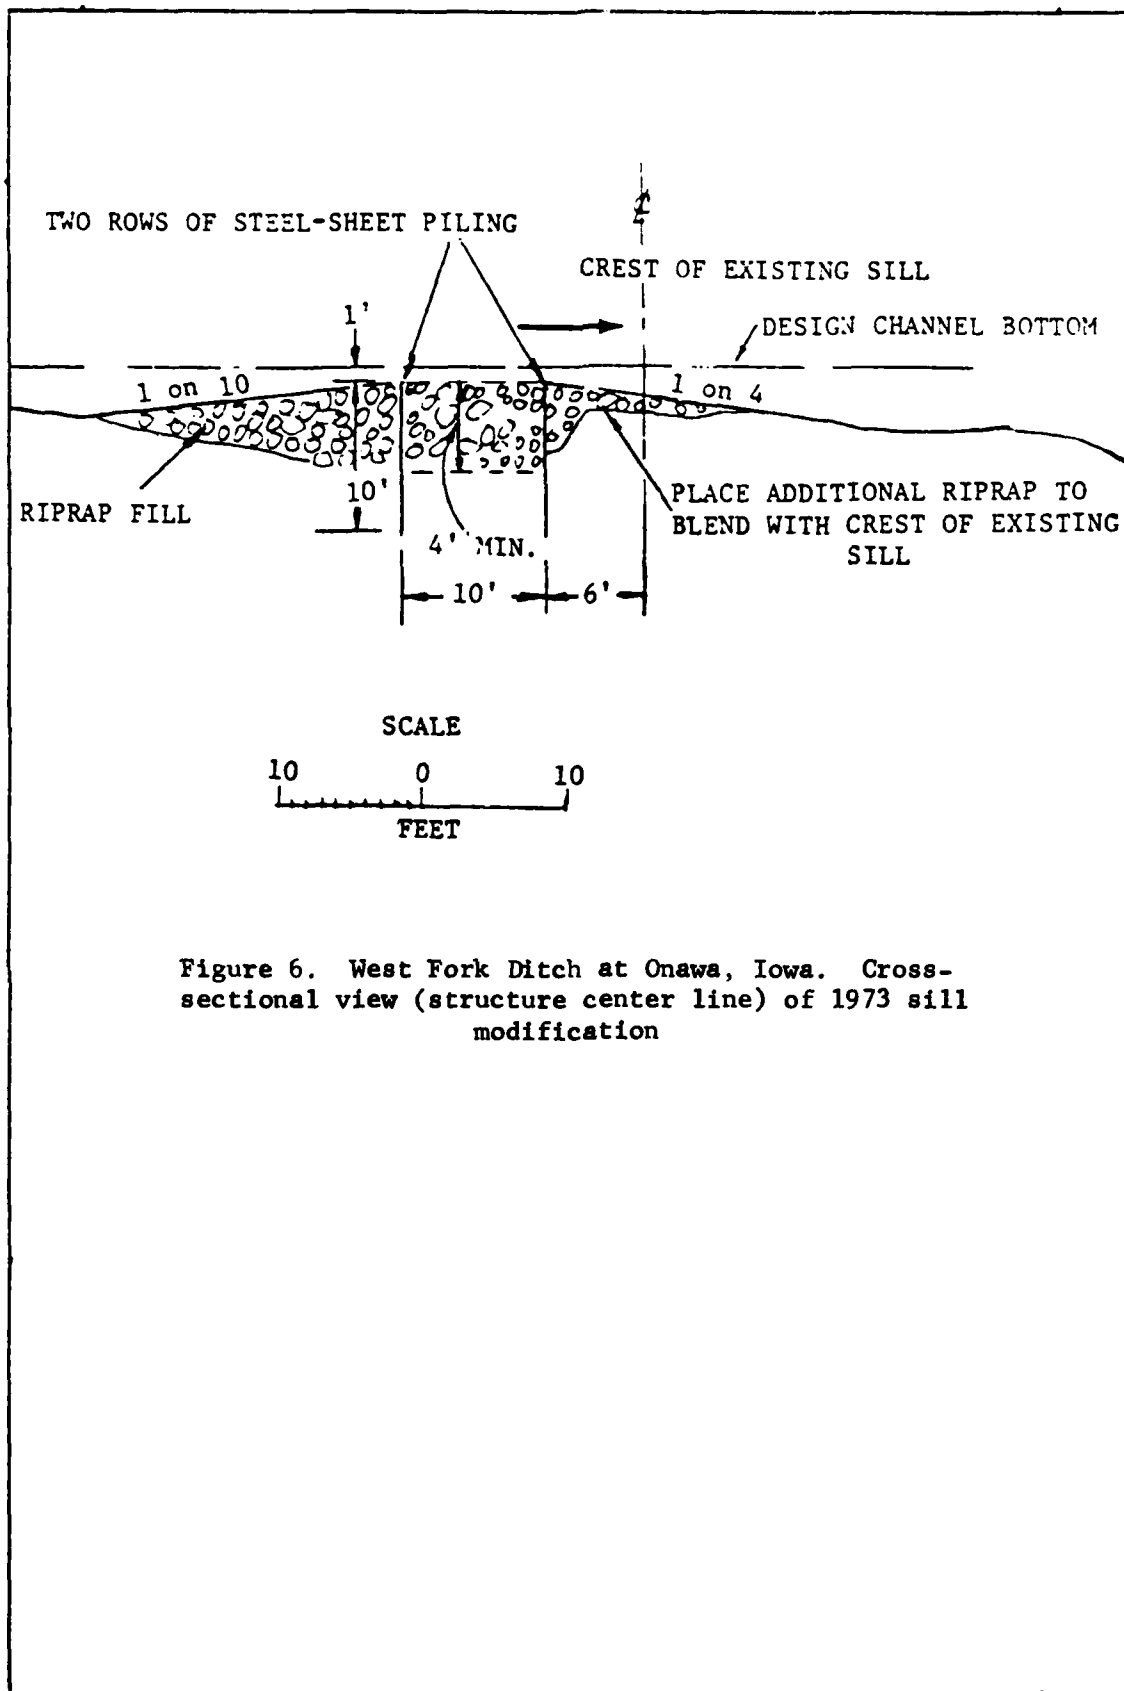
West Fork Ditch at Onawa, Iowa. Cross-sectional view (structure center line) of 1973 sill modification
